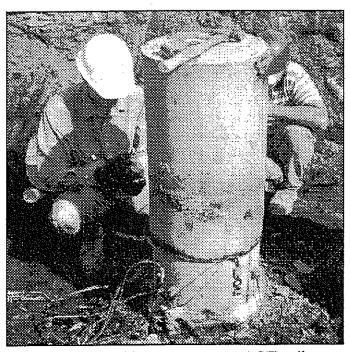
Attaching sensors to ACIP pile top extension after removing forming shell
